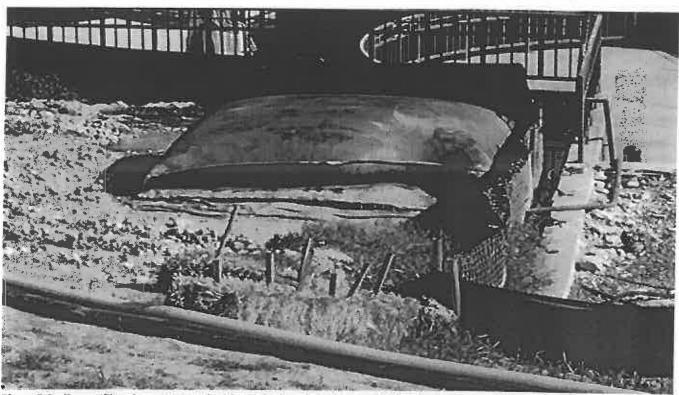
Sediment filter bag saturated with mud, placed stack on used filter bags pumped off the site North Side.
